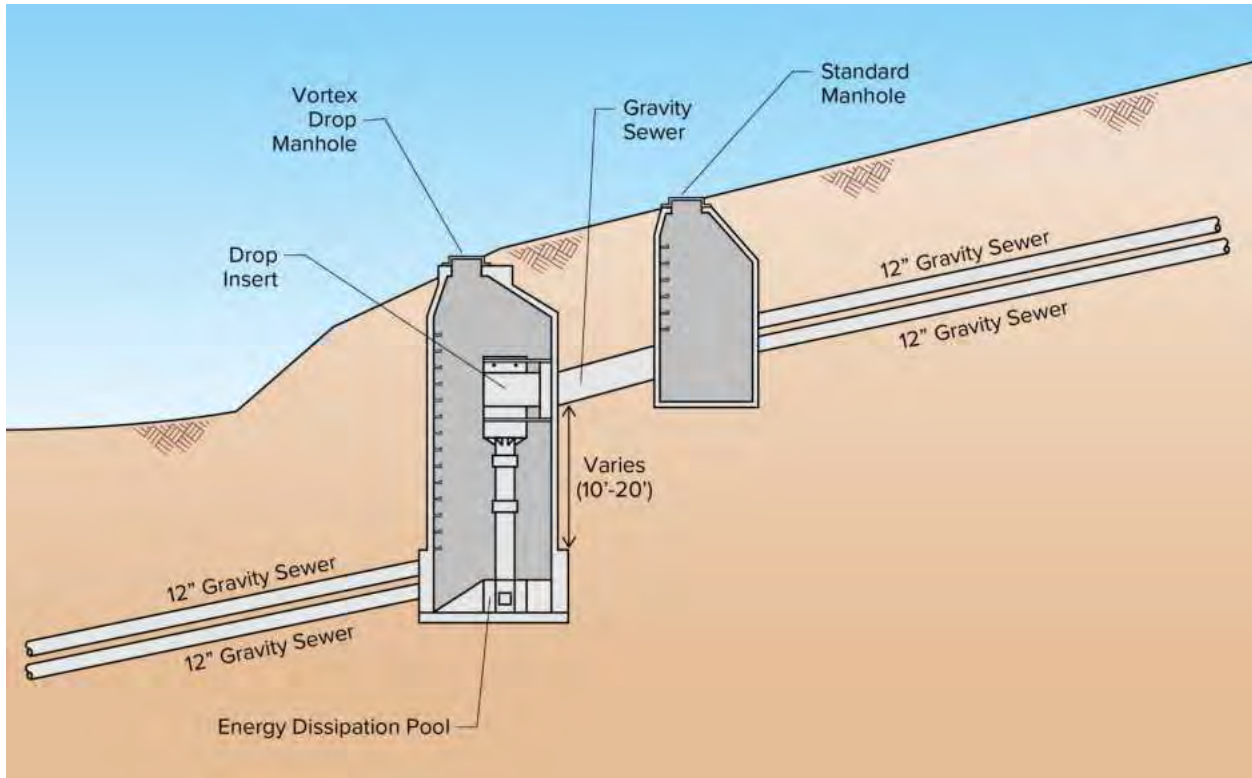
Vortex Drop Manhole and Intermediate Manhole
